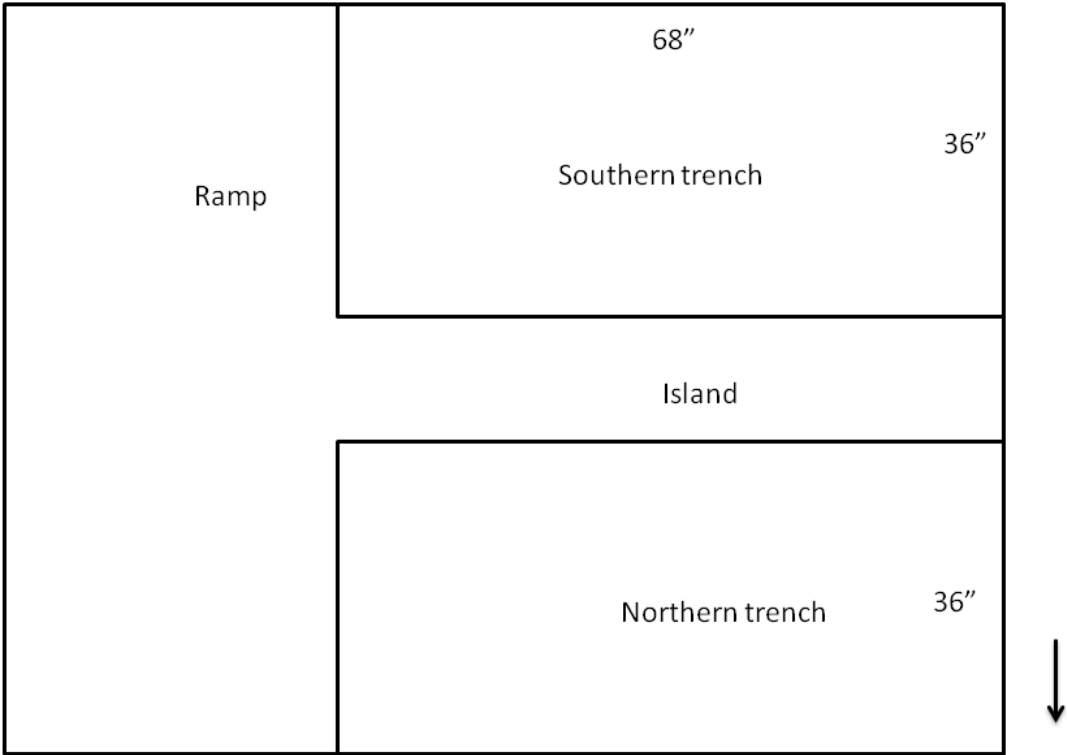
Water connection area pit, showing additional excavations uncovering old unmarked utilities
